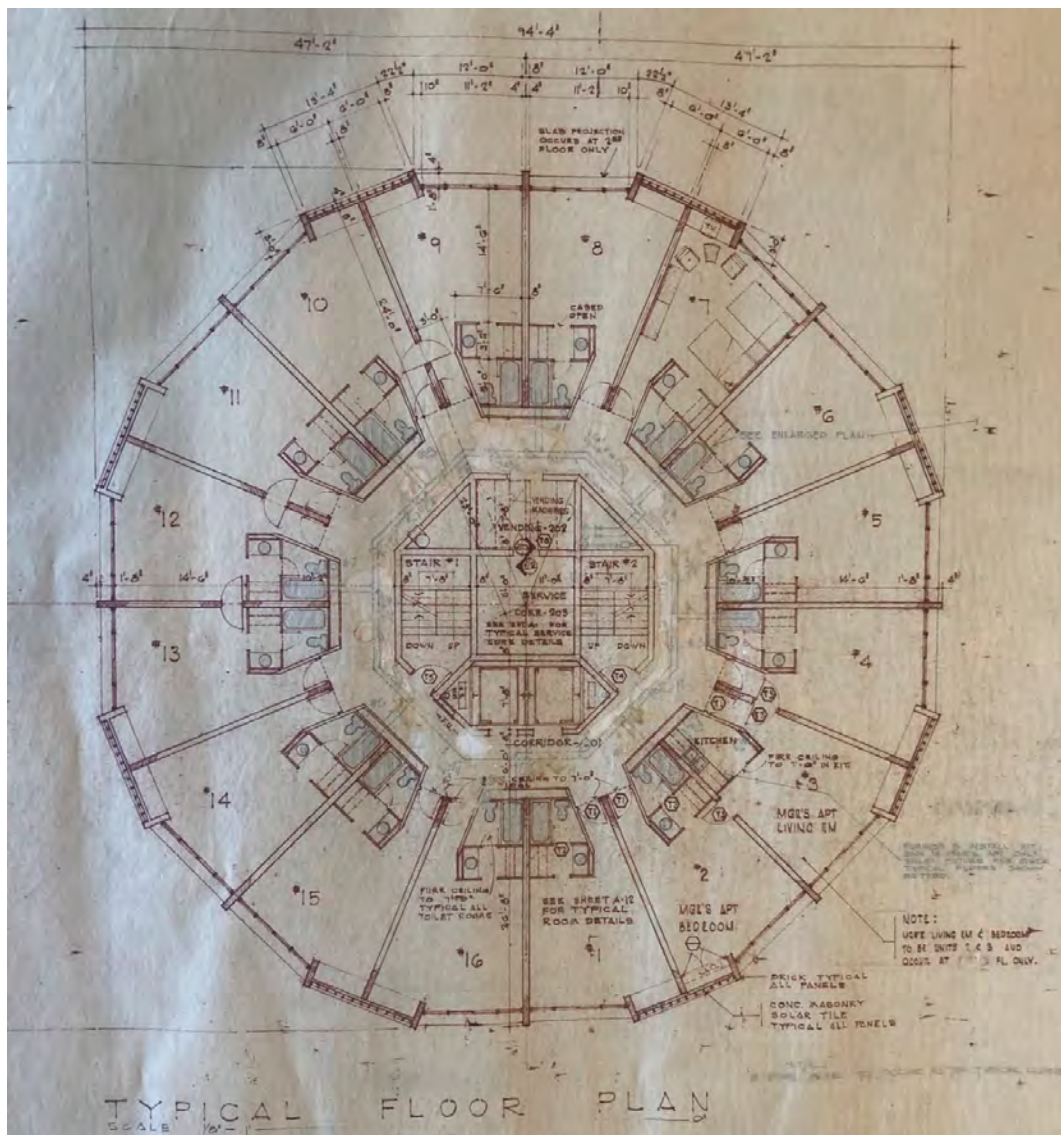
Typical floorplan from Lundgren & Maurer's drawings.⁴¹²
